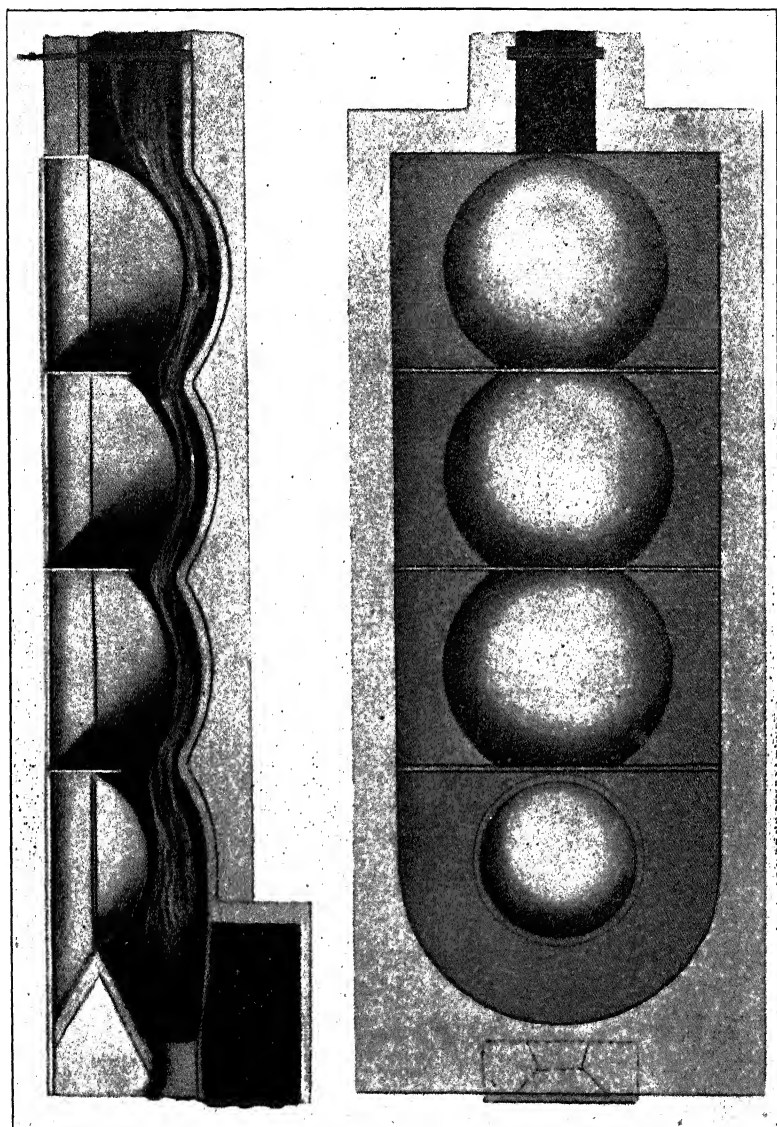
Plan and longitudinal section of a modern "copper wall."
